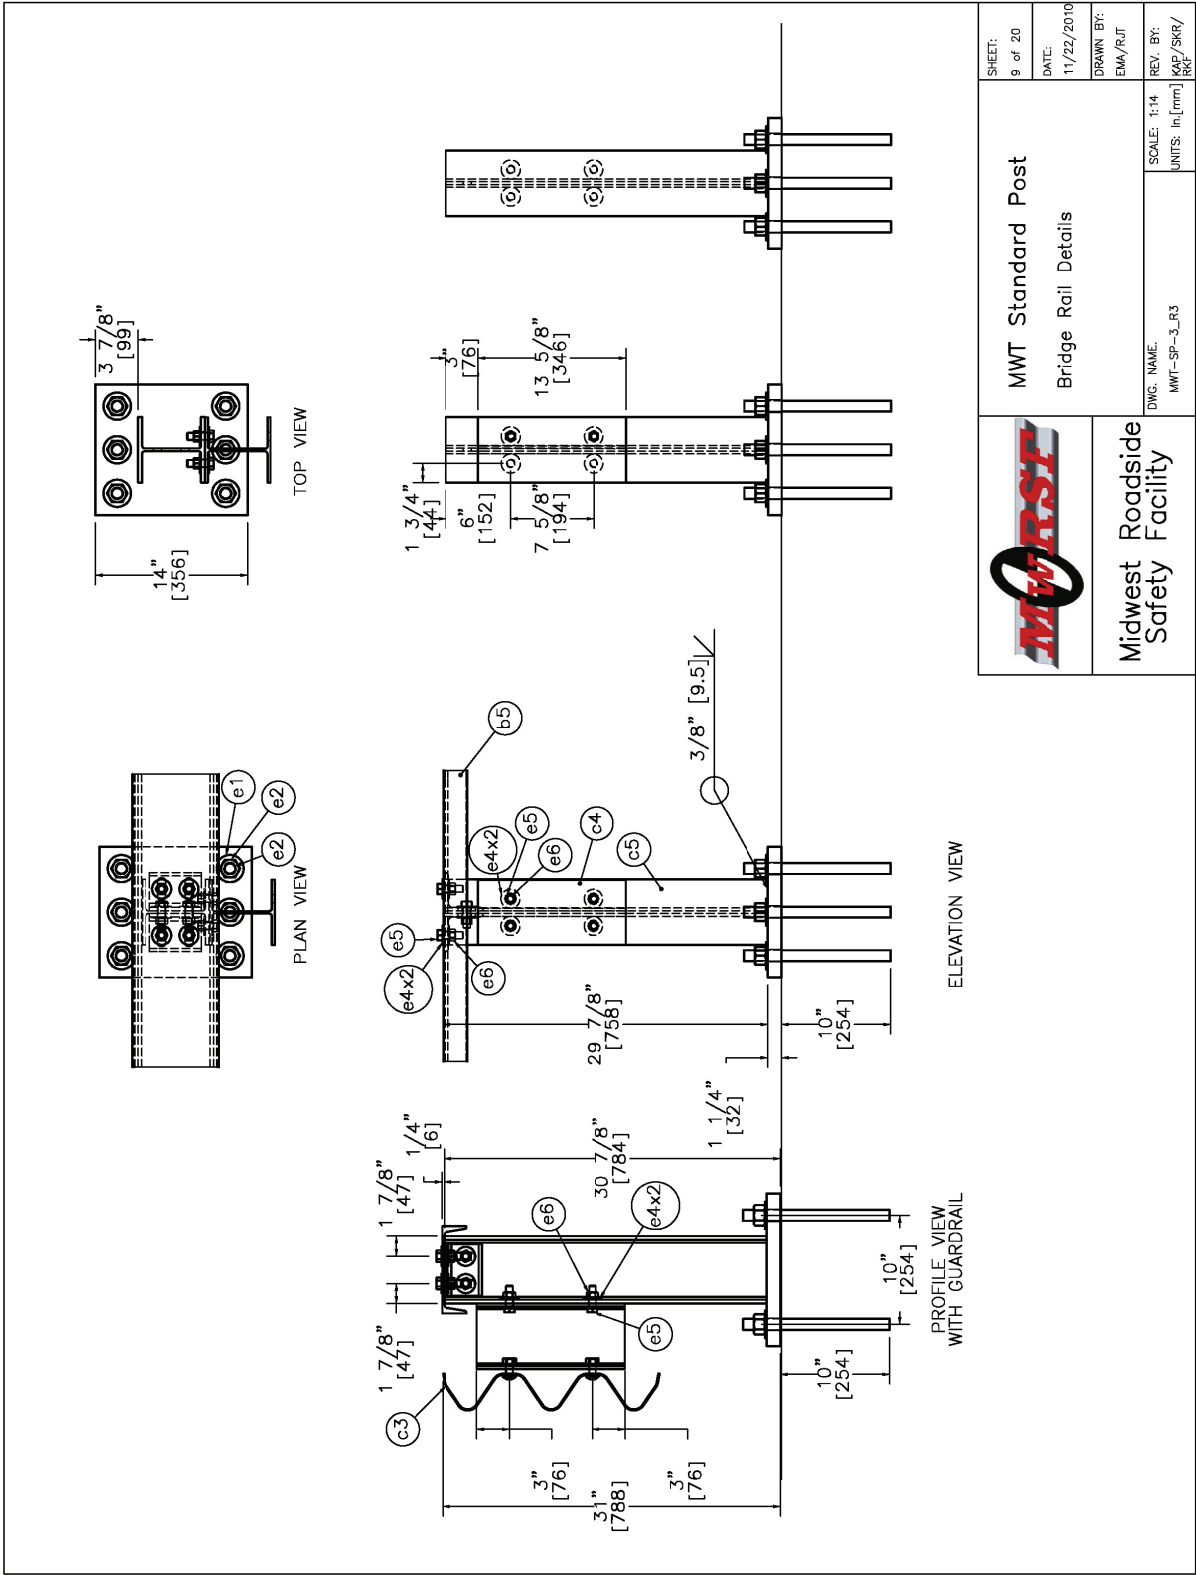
Bridge Rail Details, Test Nos. MWTSP-1 through 3
